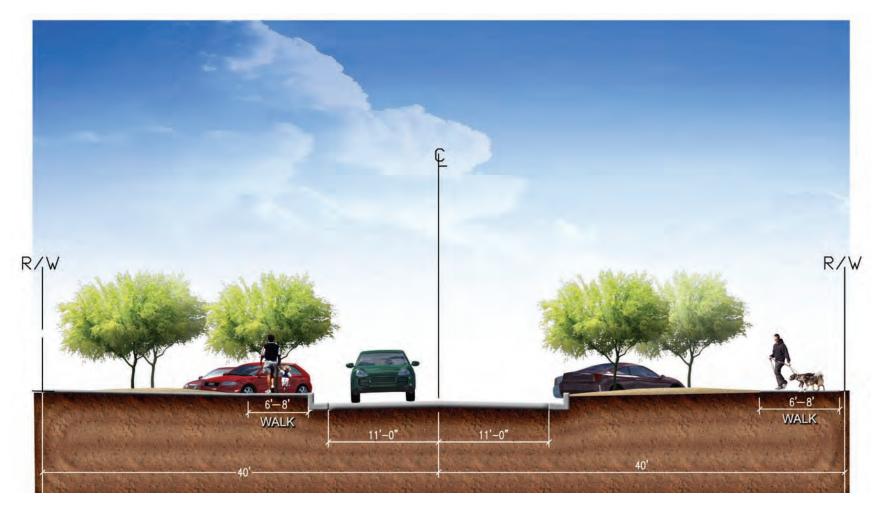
| Themed Road(s) - B Section (80' R.O.W.)
